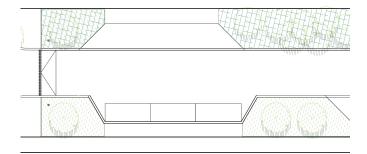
Typical Plan of Parallel Parking on Primary and Secondary Streets
